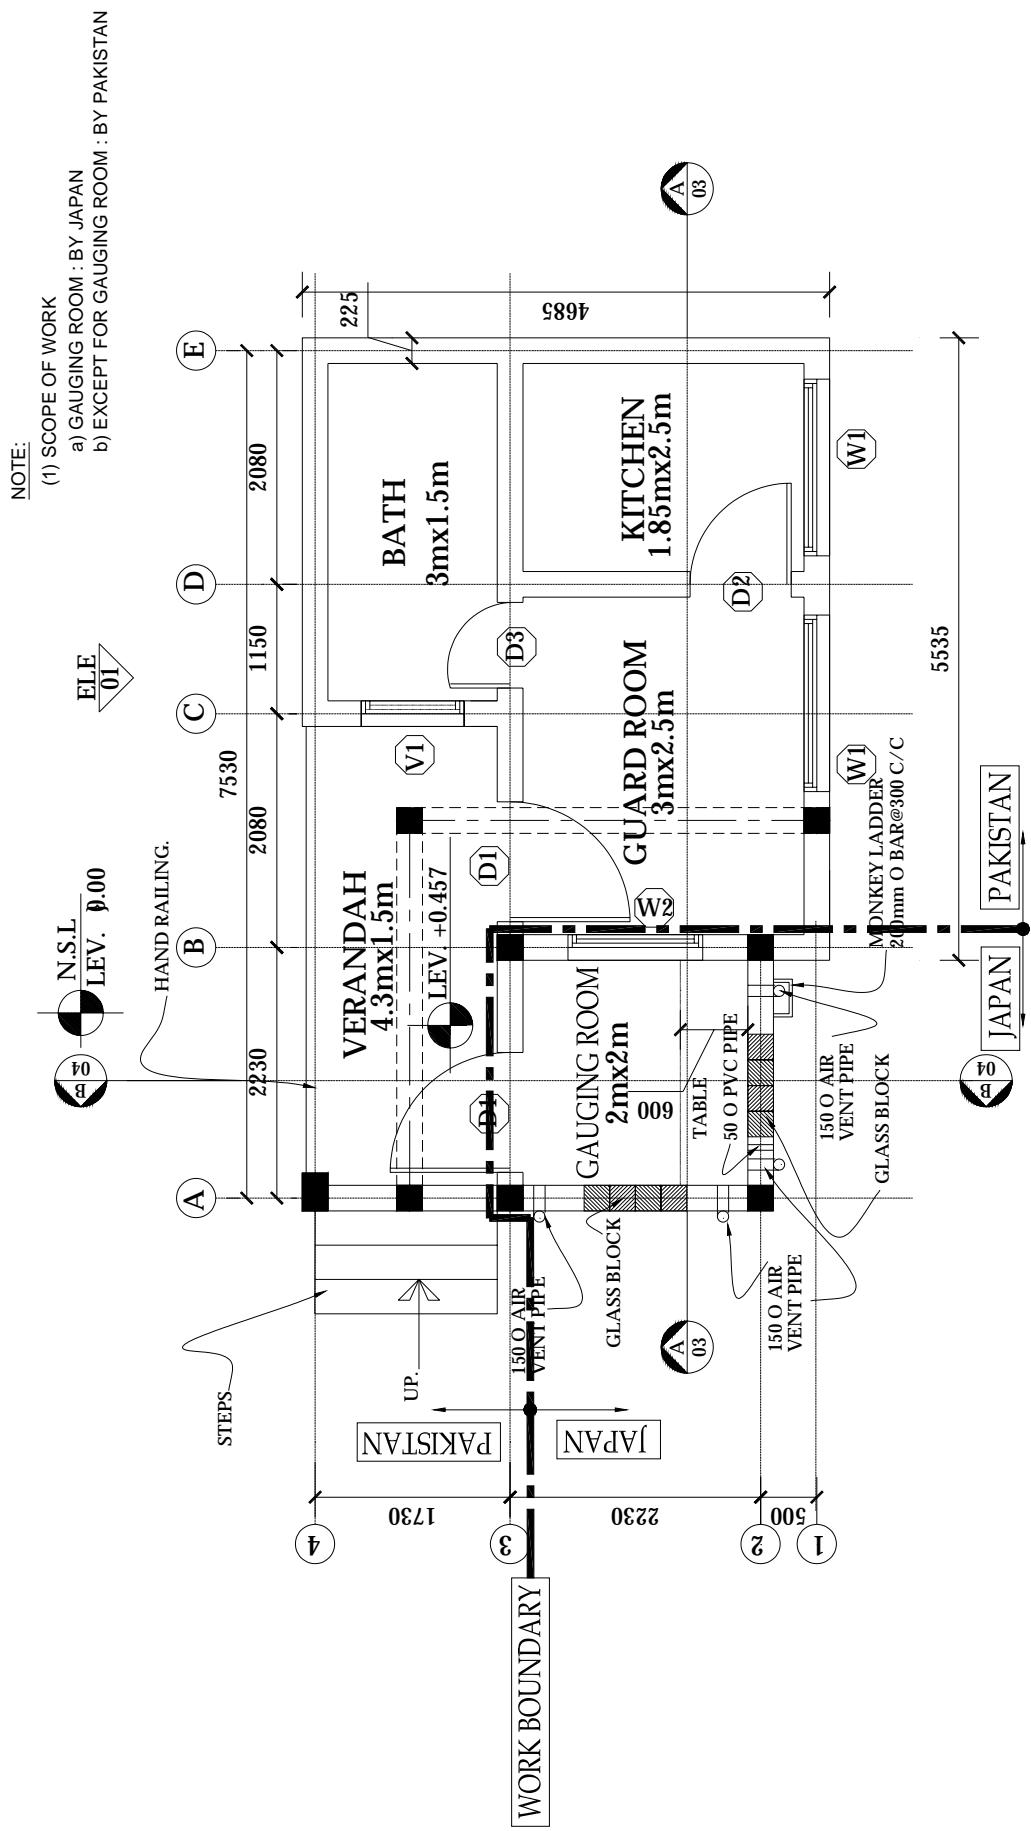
Layout Plan of Rainfall Gauging Station (Bokra)
